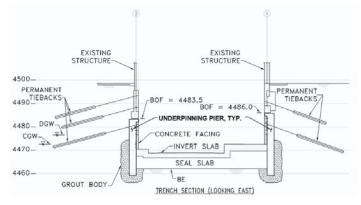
Underpinning Retaining Walls: Cross-section at Fitzgerald's Garage.
